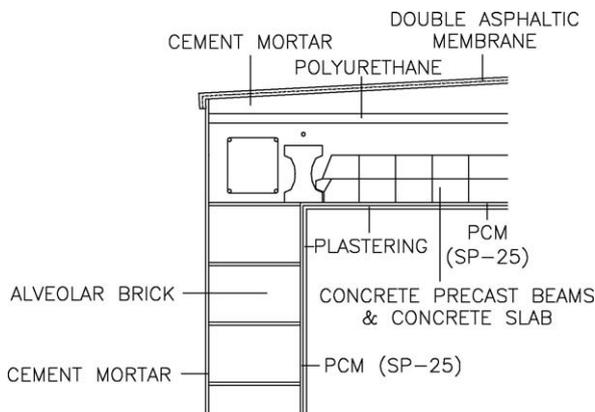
Section of the constructive solution for the alveolar brick cubicles.
